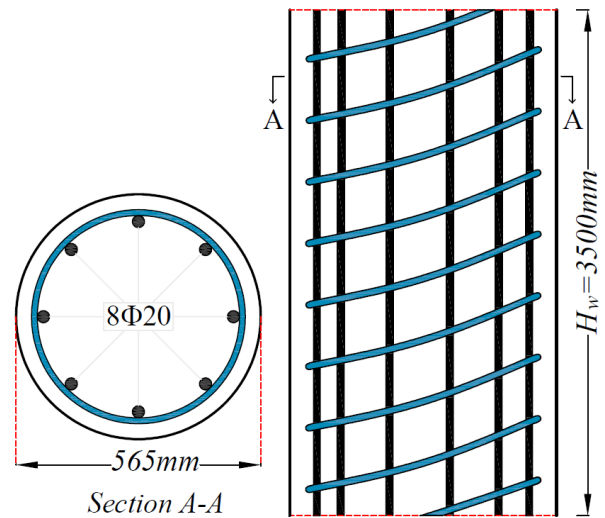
Sectional geometry and reinforcement layout view of the designed RC circular columns
